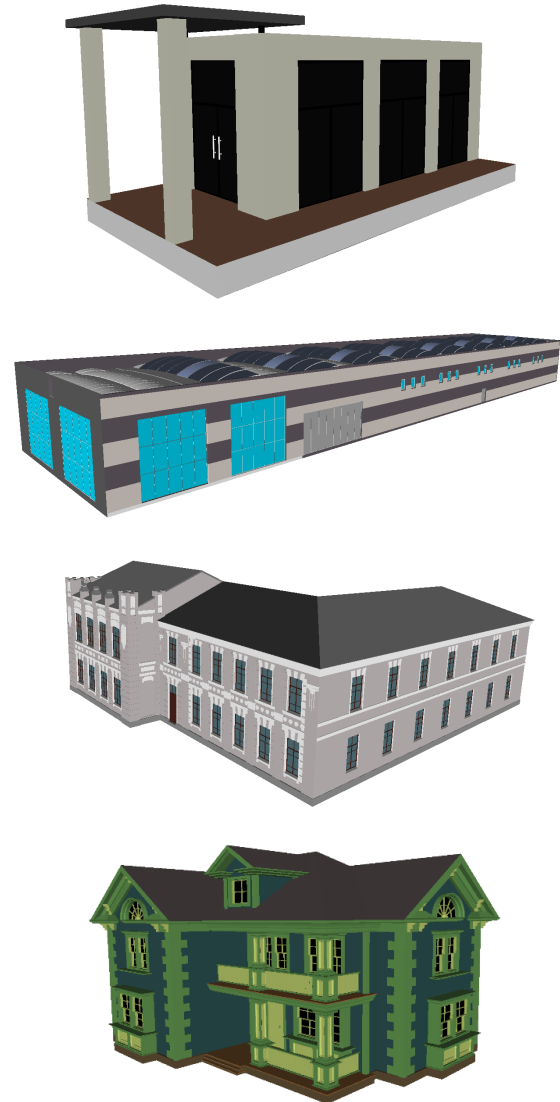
Four different building types. From top to bottom: commercial building, industrial building, institutional building, and residential building.
